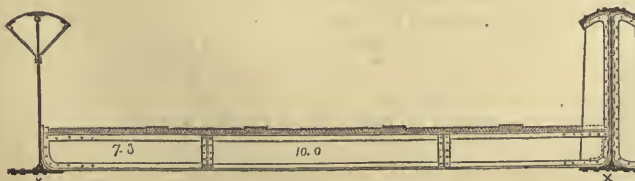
Section through Girder, showing the Stays to Stiffen the Top Plate.
